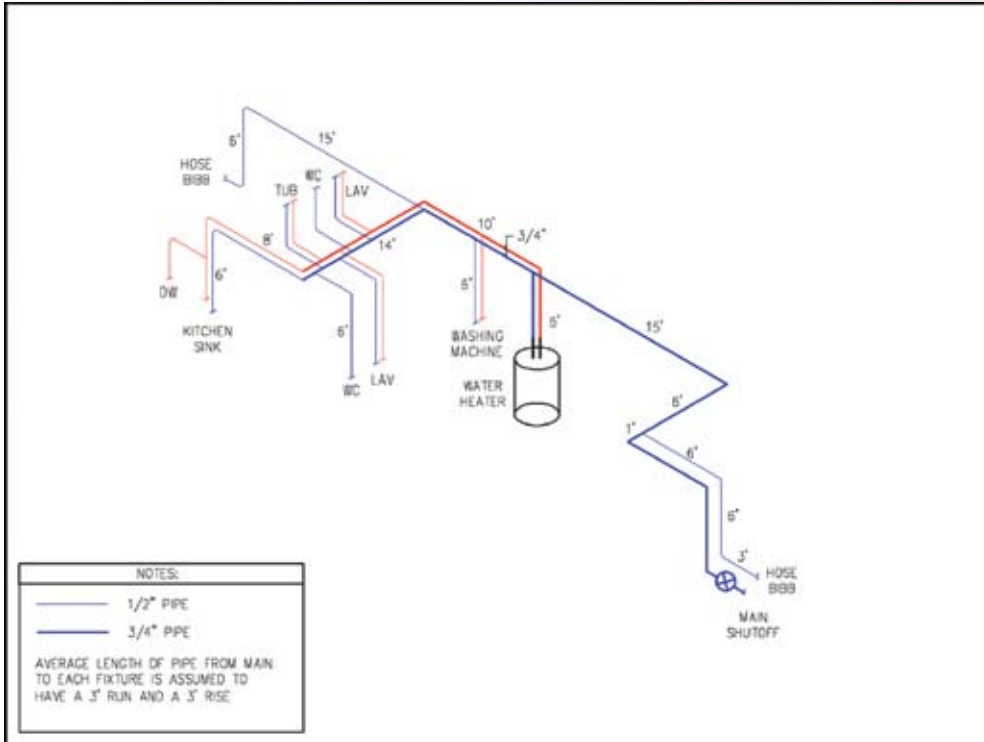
Trunk and Branch Isometric Riser for the Townhouse
